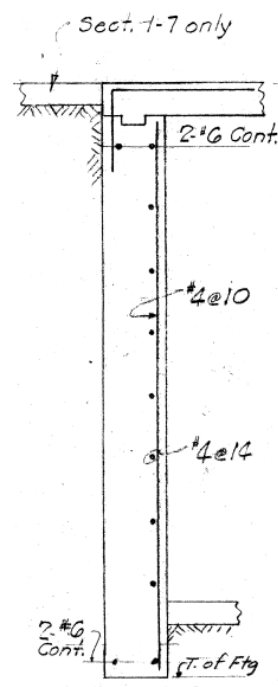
Section through Typical Retaining Wall at Level Step ups, sect. 1-7 on S1
